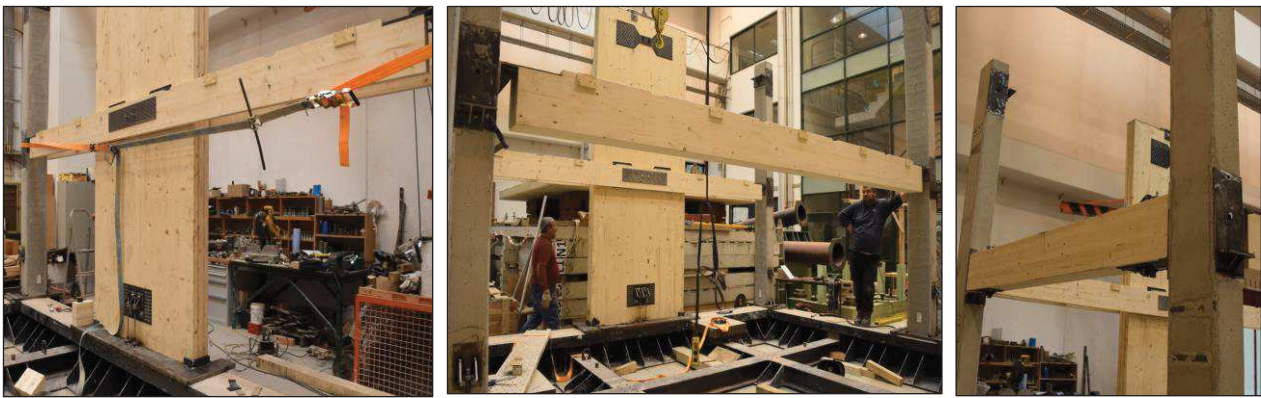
Phase 3: Edge beams (left), central beam (centre) and seismic beams (right) lifted into place.
